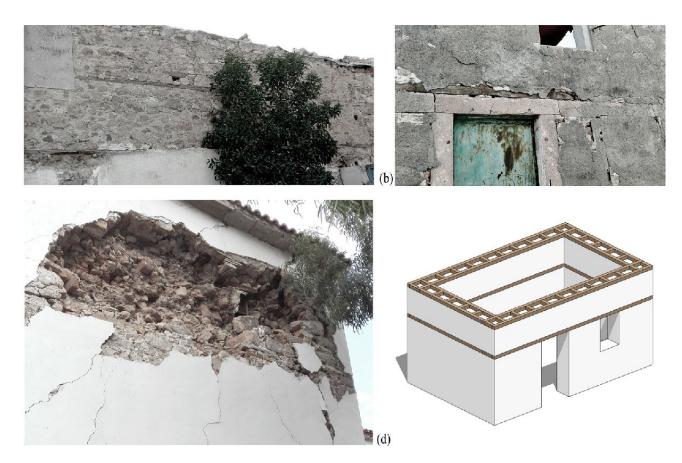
Intact timber-laced masonry walls and typical multi-leaves wall sections with lack of transversal interlocking stones (Vlachakis, 2020)
